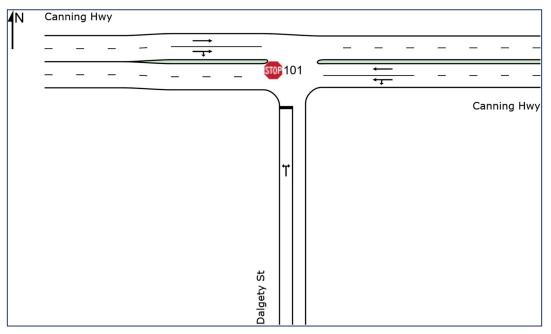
Canning Highway/Dalgety Street Intersection SIDRA layout (for Scenario 3)
